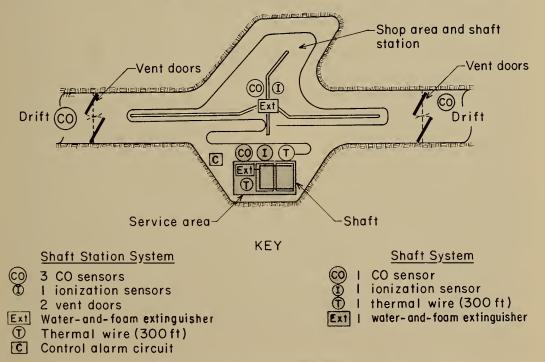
Mine shaft fire protection system design concept-plan view.
